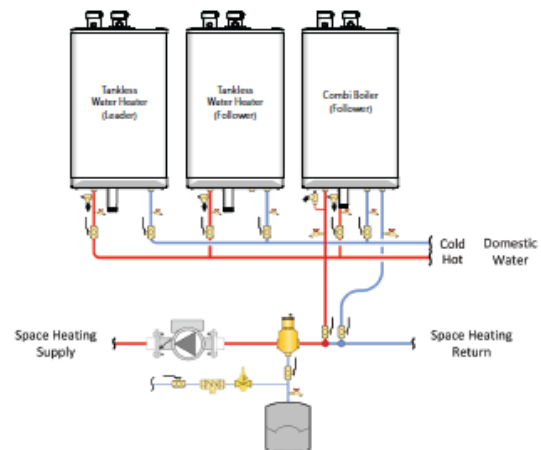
Typical Tankless Water Heater and Combi Boiler cascade piping – concept drawing. This drawing is only a simple schematic guide
